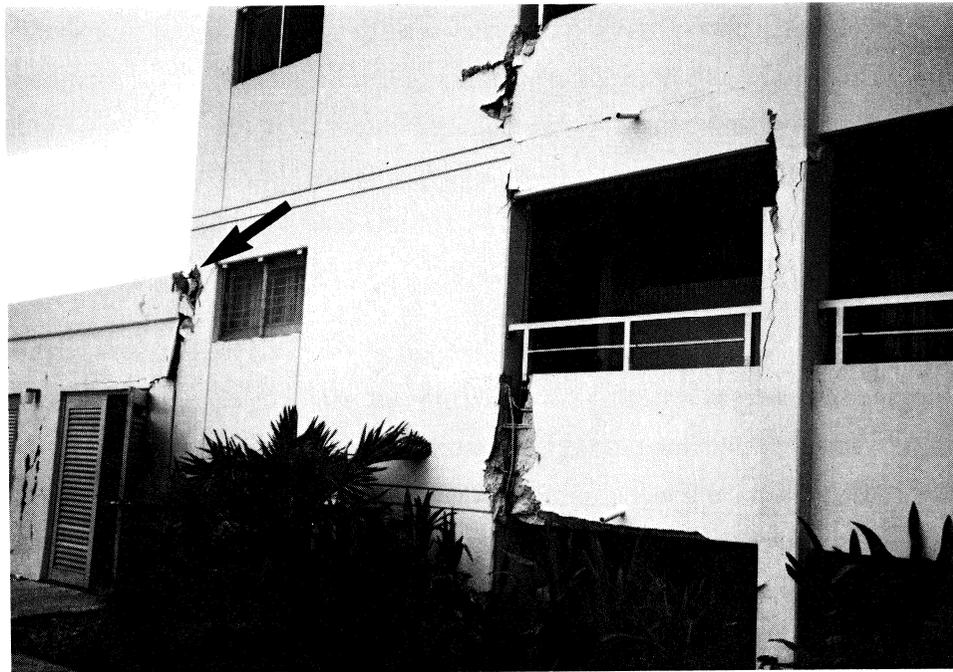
Shattered columns, shear cracking at spandrels, and pounding damage at the interface of the one-story mechanical building (at left) are seen along the front fact of the Alupang Cove.
